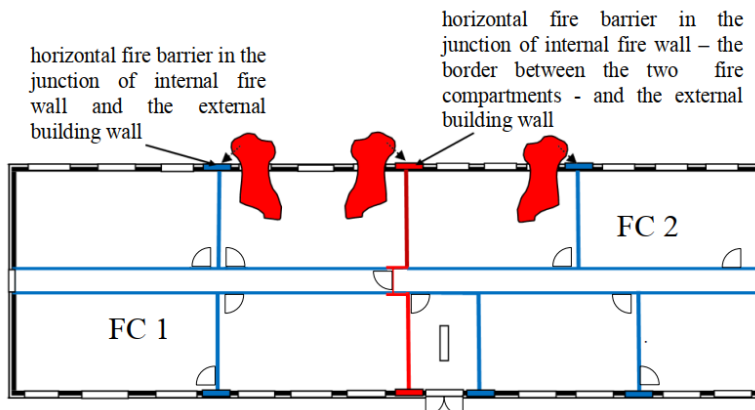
Vertical fire barriers along junction of the border of two fire compartments and external building wall (red) and along junctions of the internal fire walls and external building wall (blue) [13].
